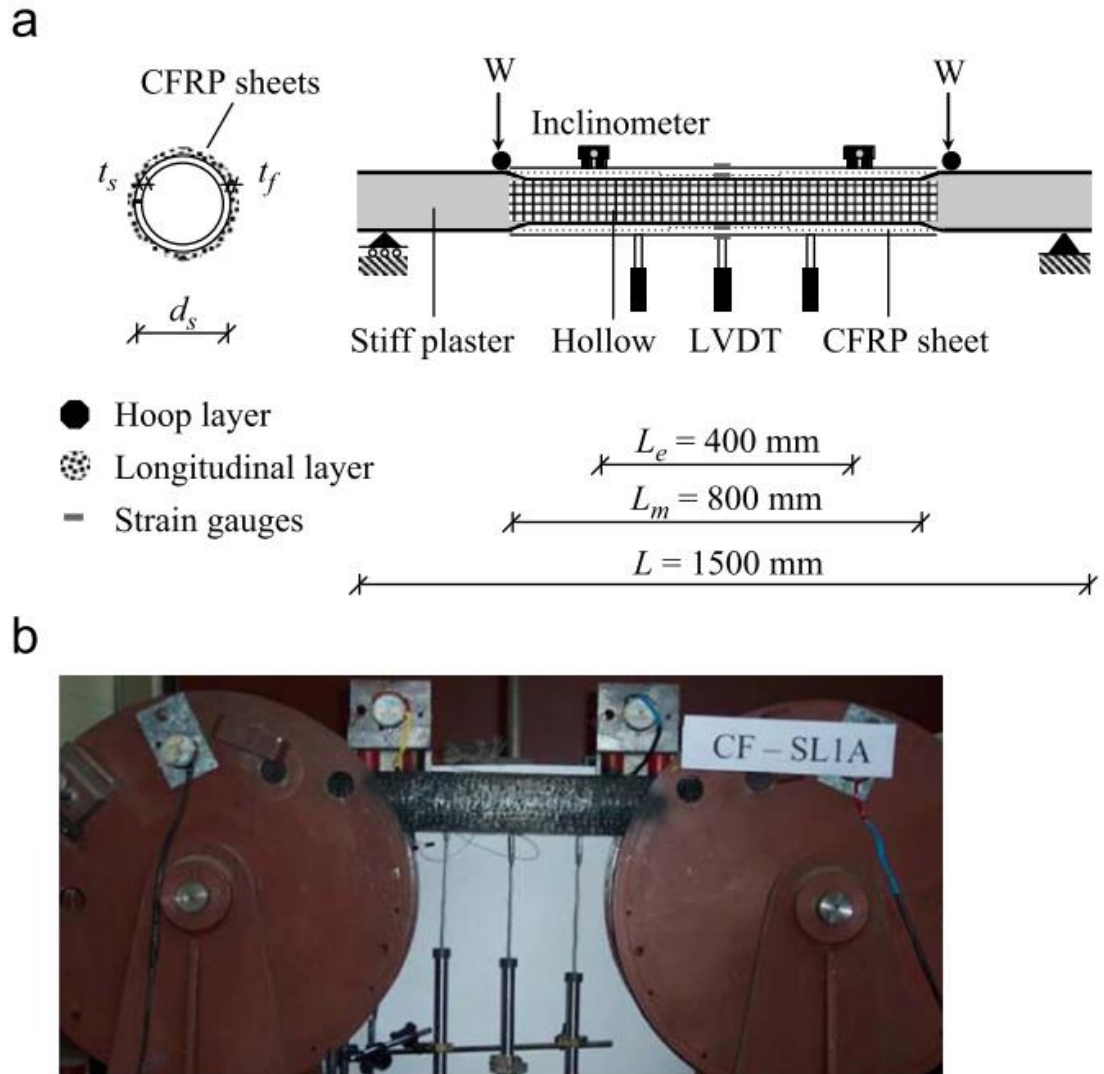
Test set-up and apparatus for bending test (Source: J. Haedir et al. 2009)
